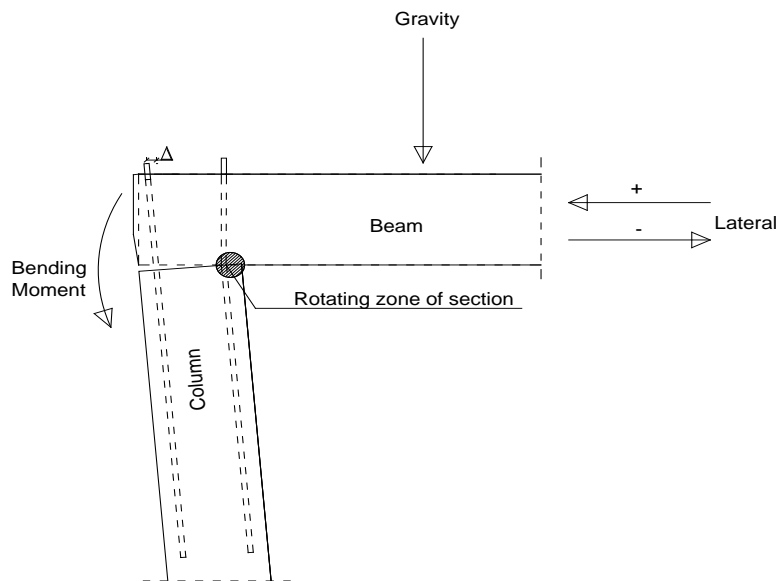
Potential flexural behavior of precast beam-to-column connection
